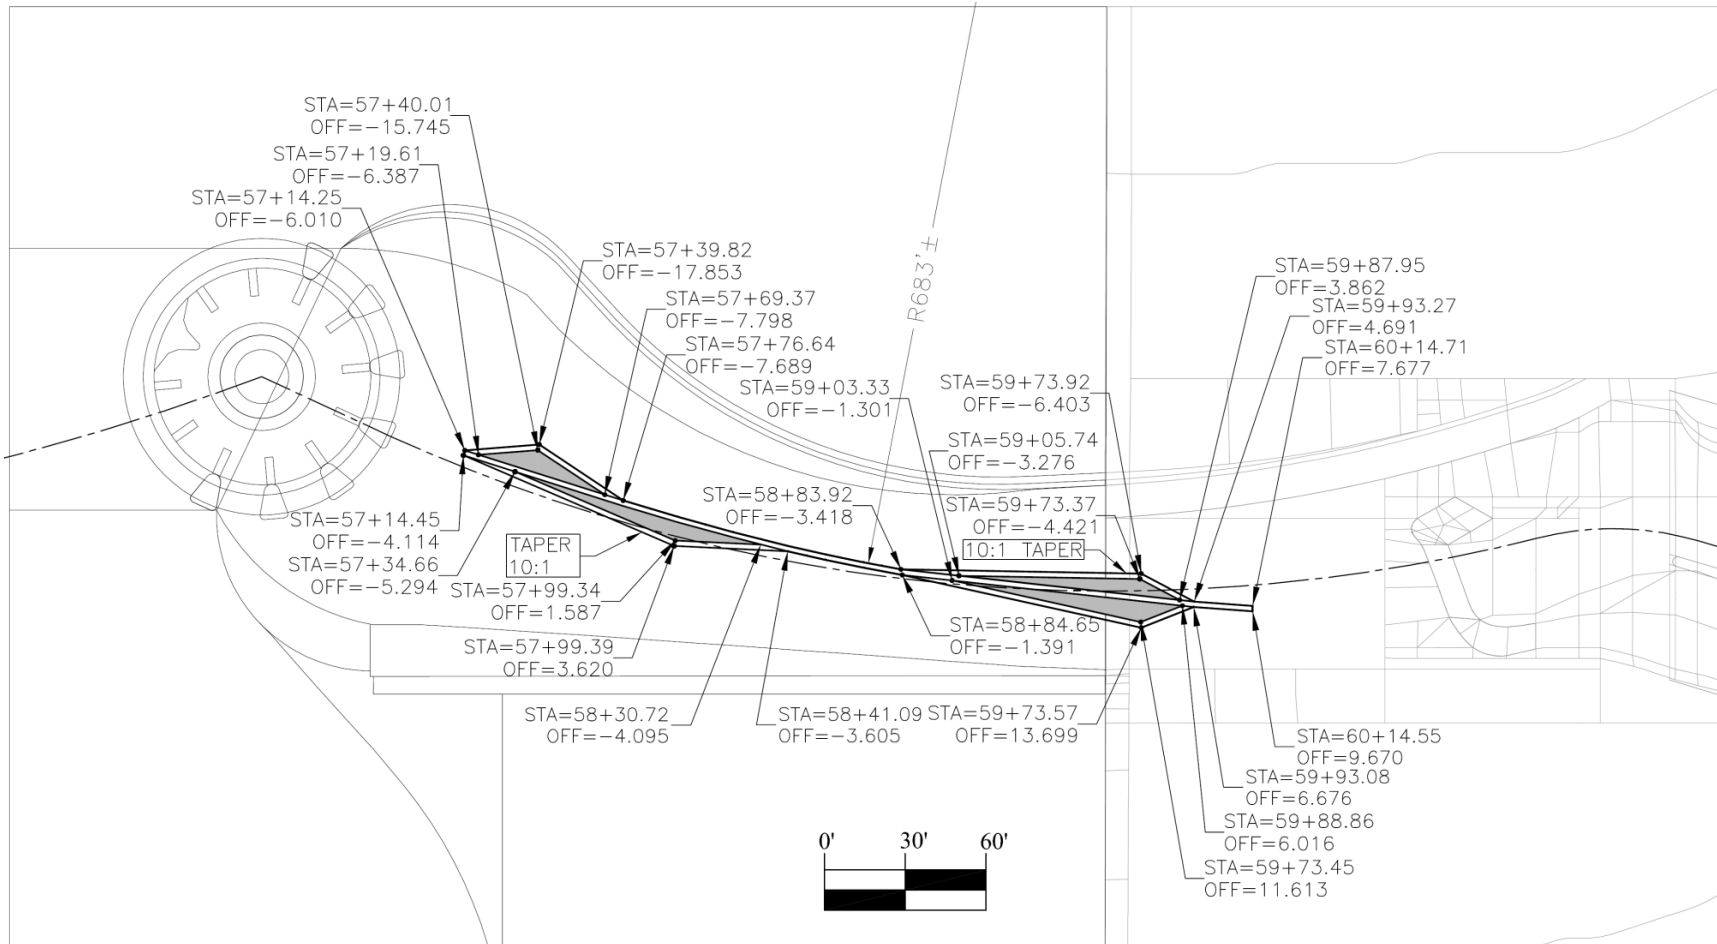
Final Inlet Channel Training Wall Configuration with Fill
